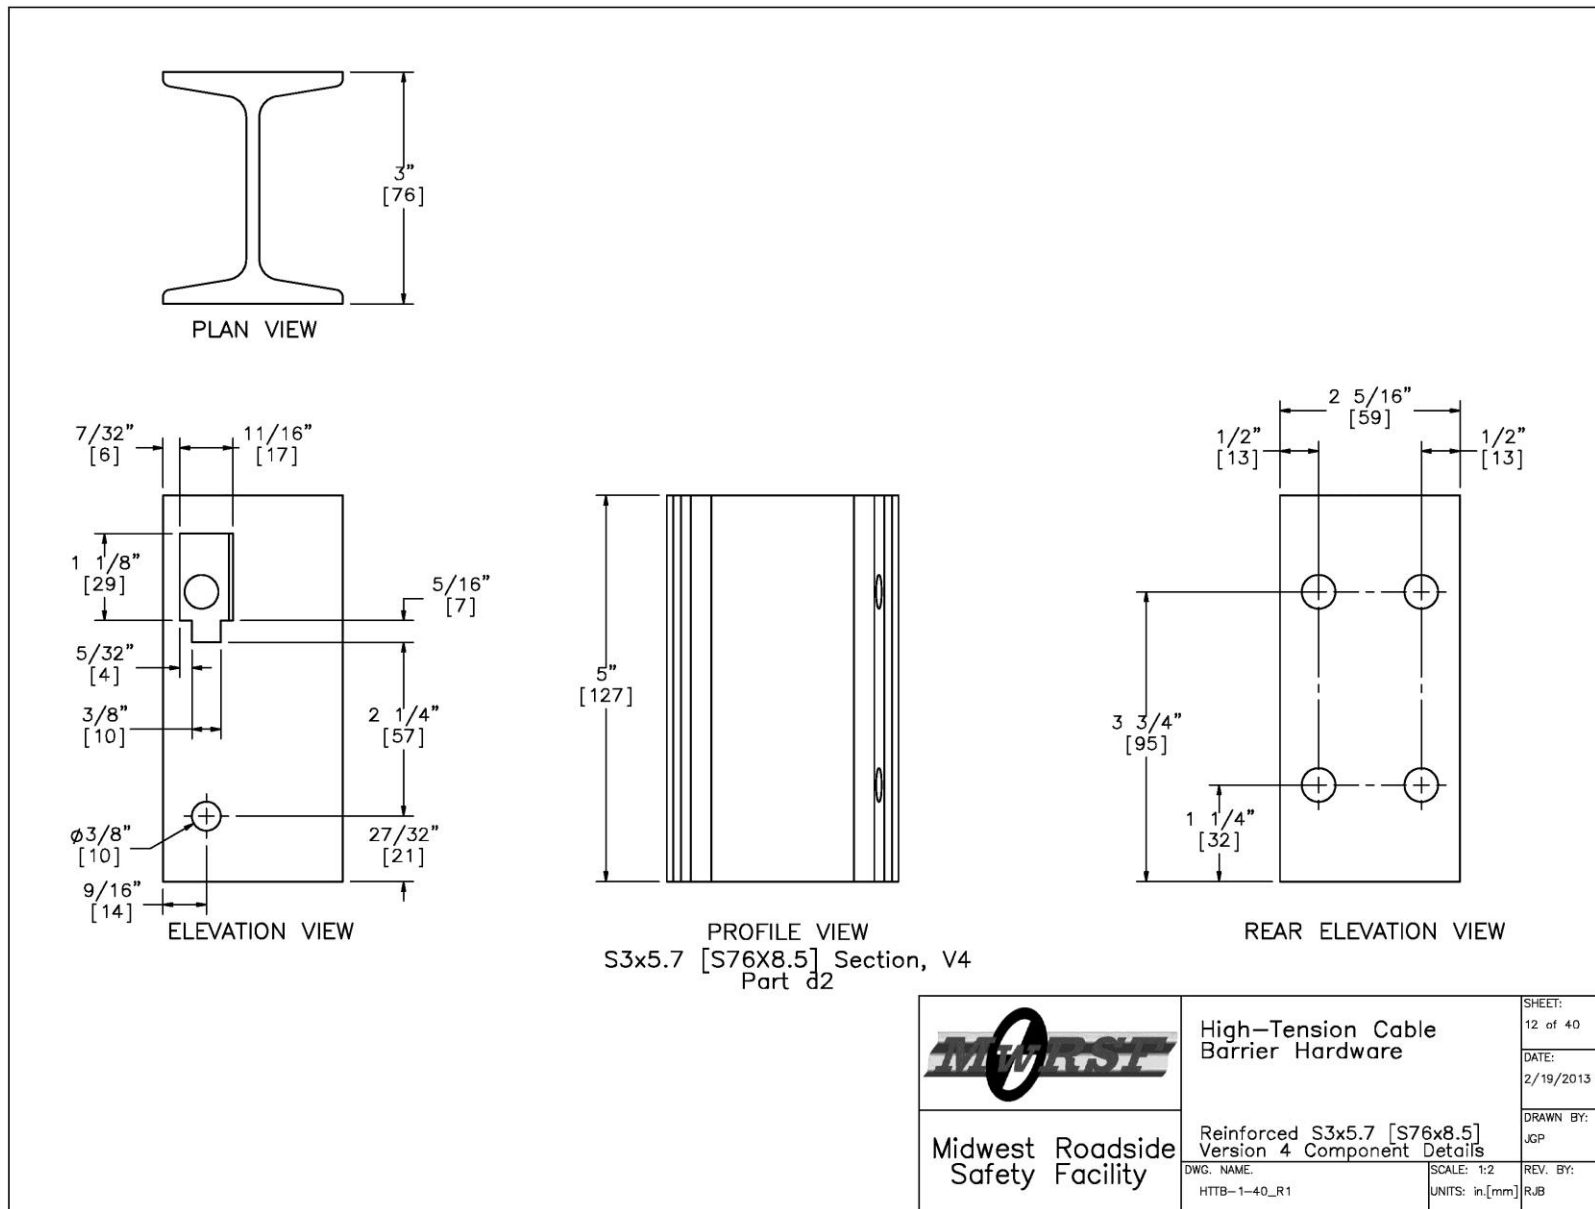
Reinforced S3x5.7 (S76x8.5) Section Version 4 Details, Test Nos. HTTB-1 through HTTB-40
